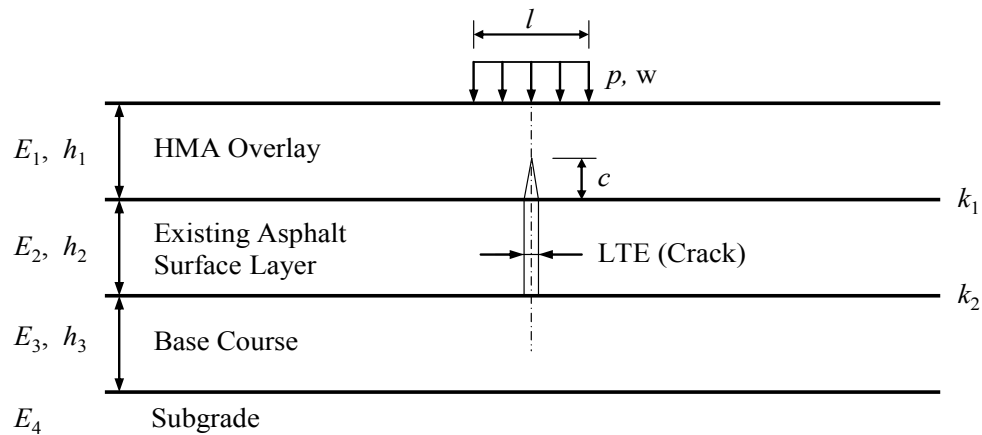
Diagram of HMA overlay on asphalt concrete pavement-bending.
